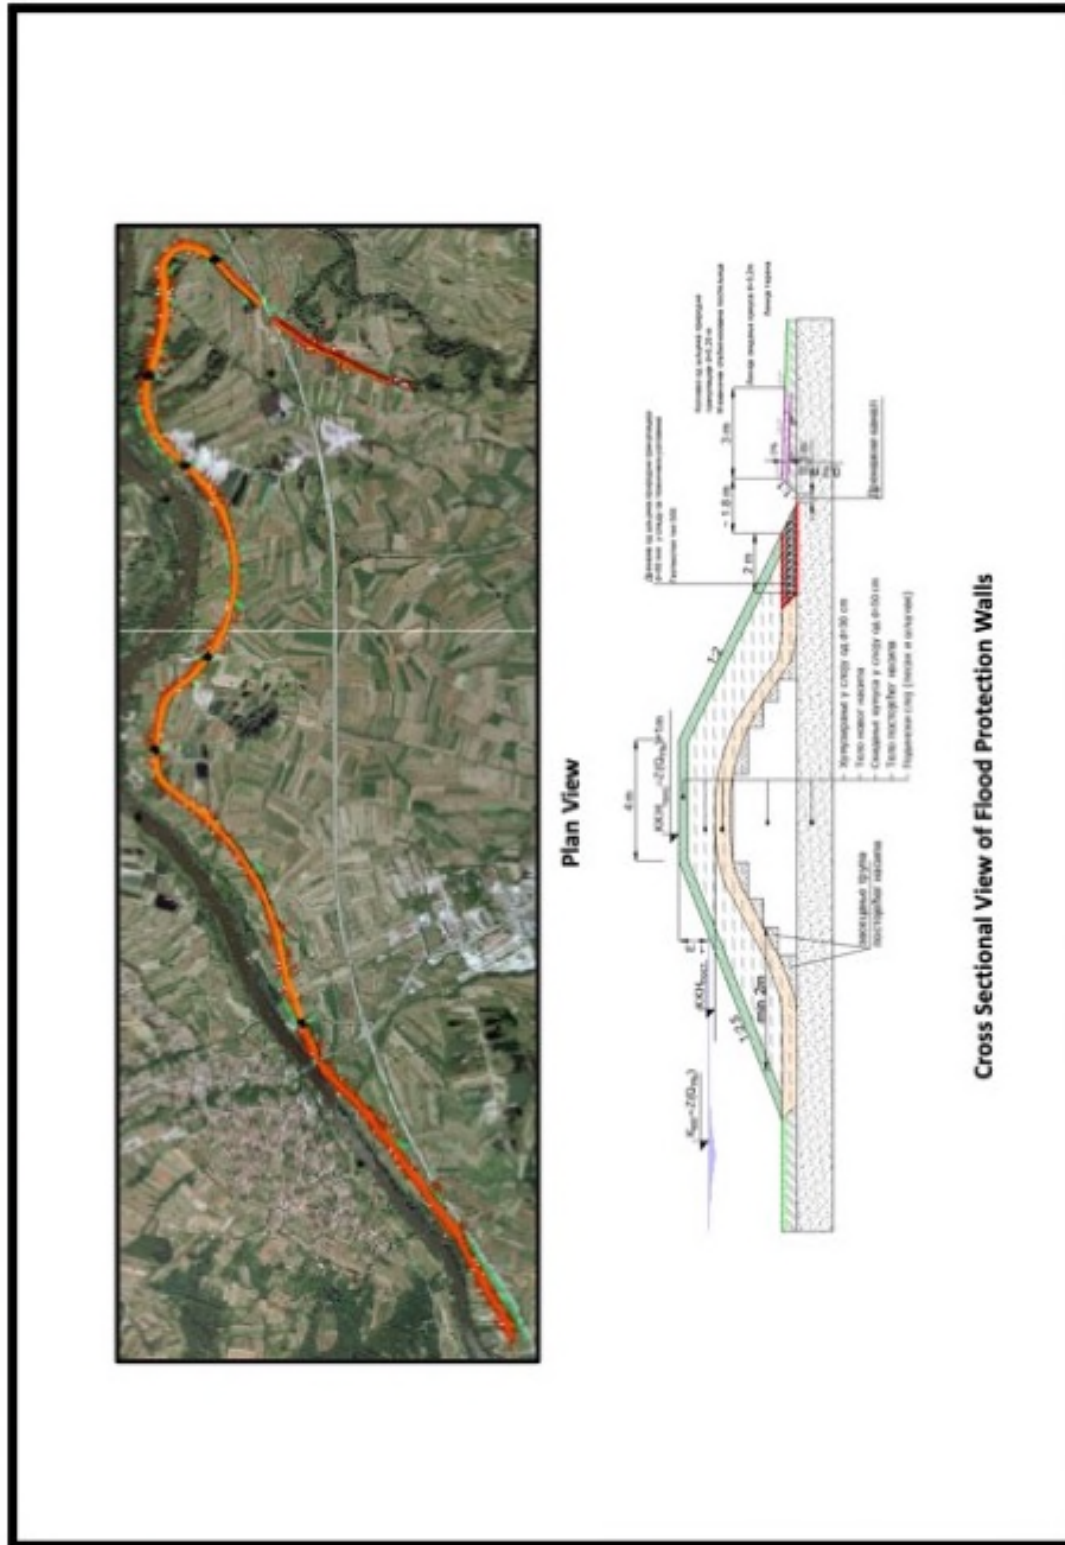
The route and typical cross-section of the Structure 3, Section-1
